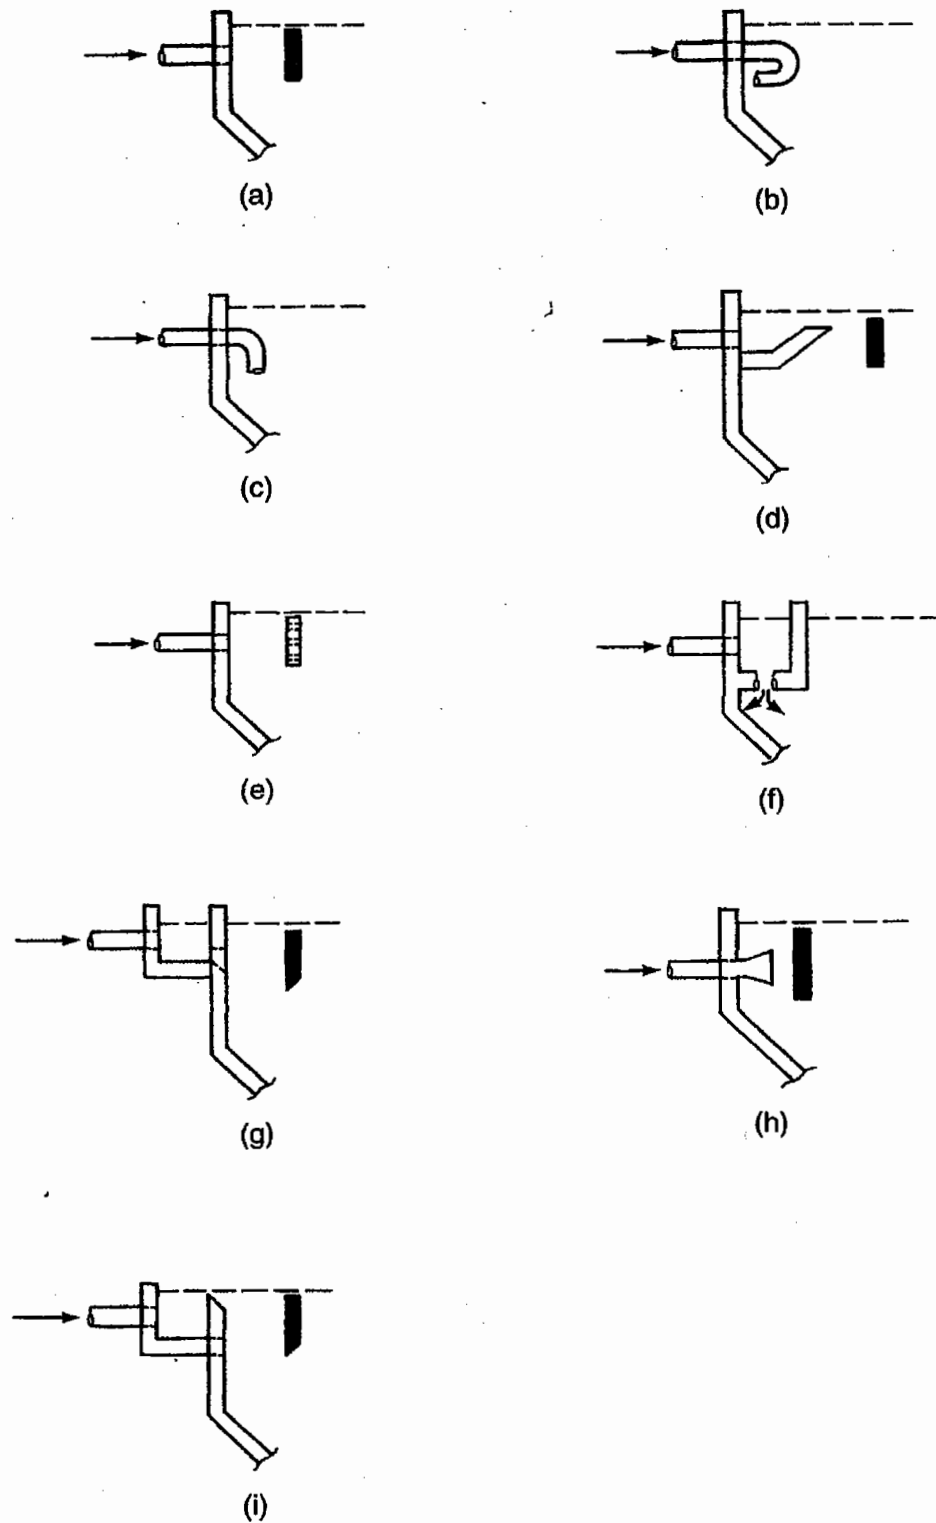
Details of Influent Structures for Rectangular Sedimentation Basin: (a) inlet pipes discharging against a baffle, (b) U-shape elbow discharging against the wall, (c) a series of inlet pipes spaced across the width with turned elbow, (d) an inclined weir with baffle, (e) perforated baffle, (f) a stilling basin with opening at the bottom, (g) pipe discharging in a channel that has series of openings discharging against a baffle, (h) a bell-shaped diverging pipe followed by a baffle, and (i) an overflow weir followed by a baffle.
